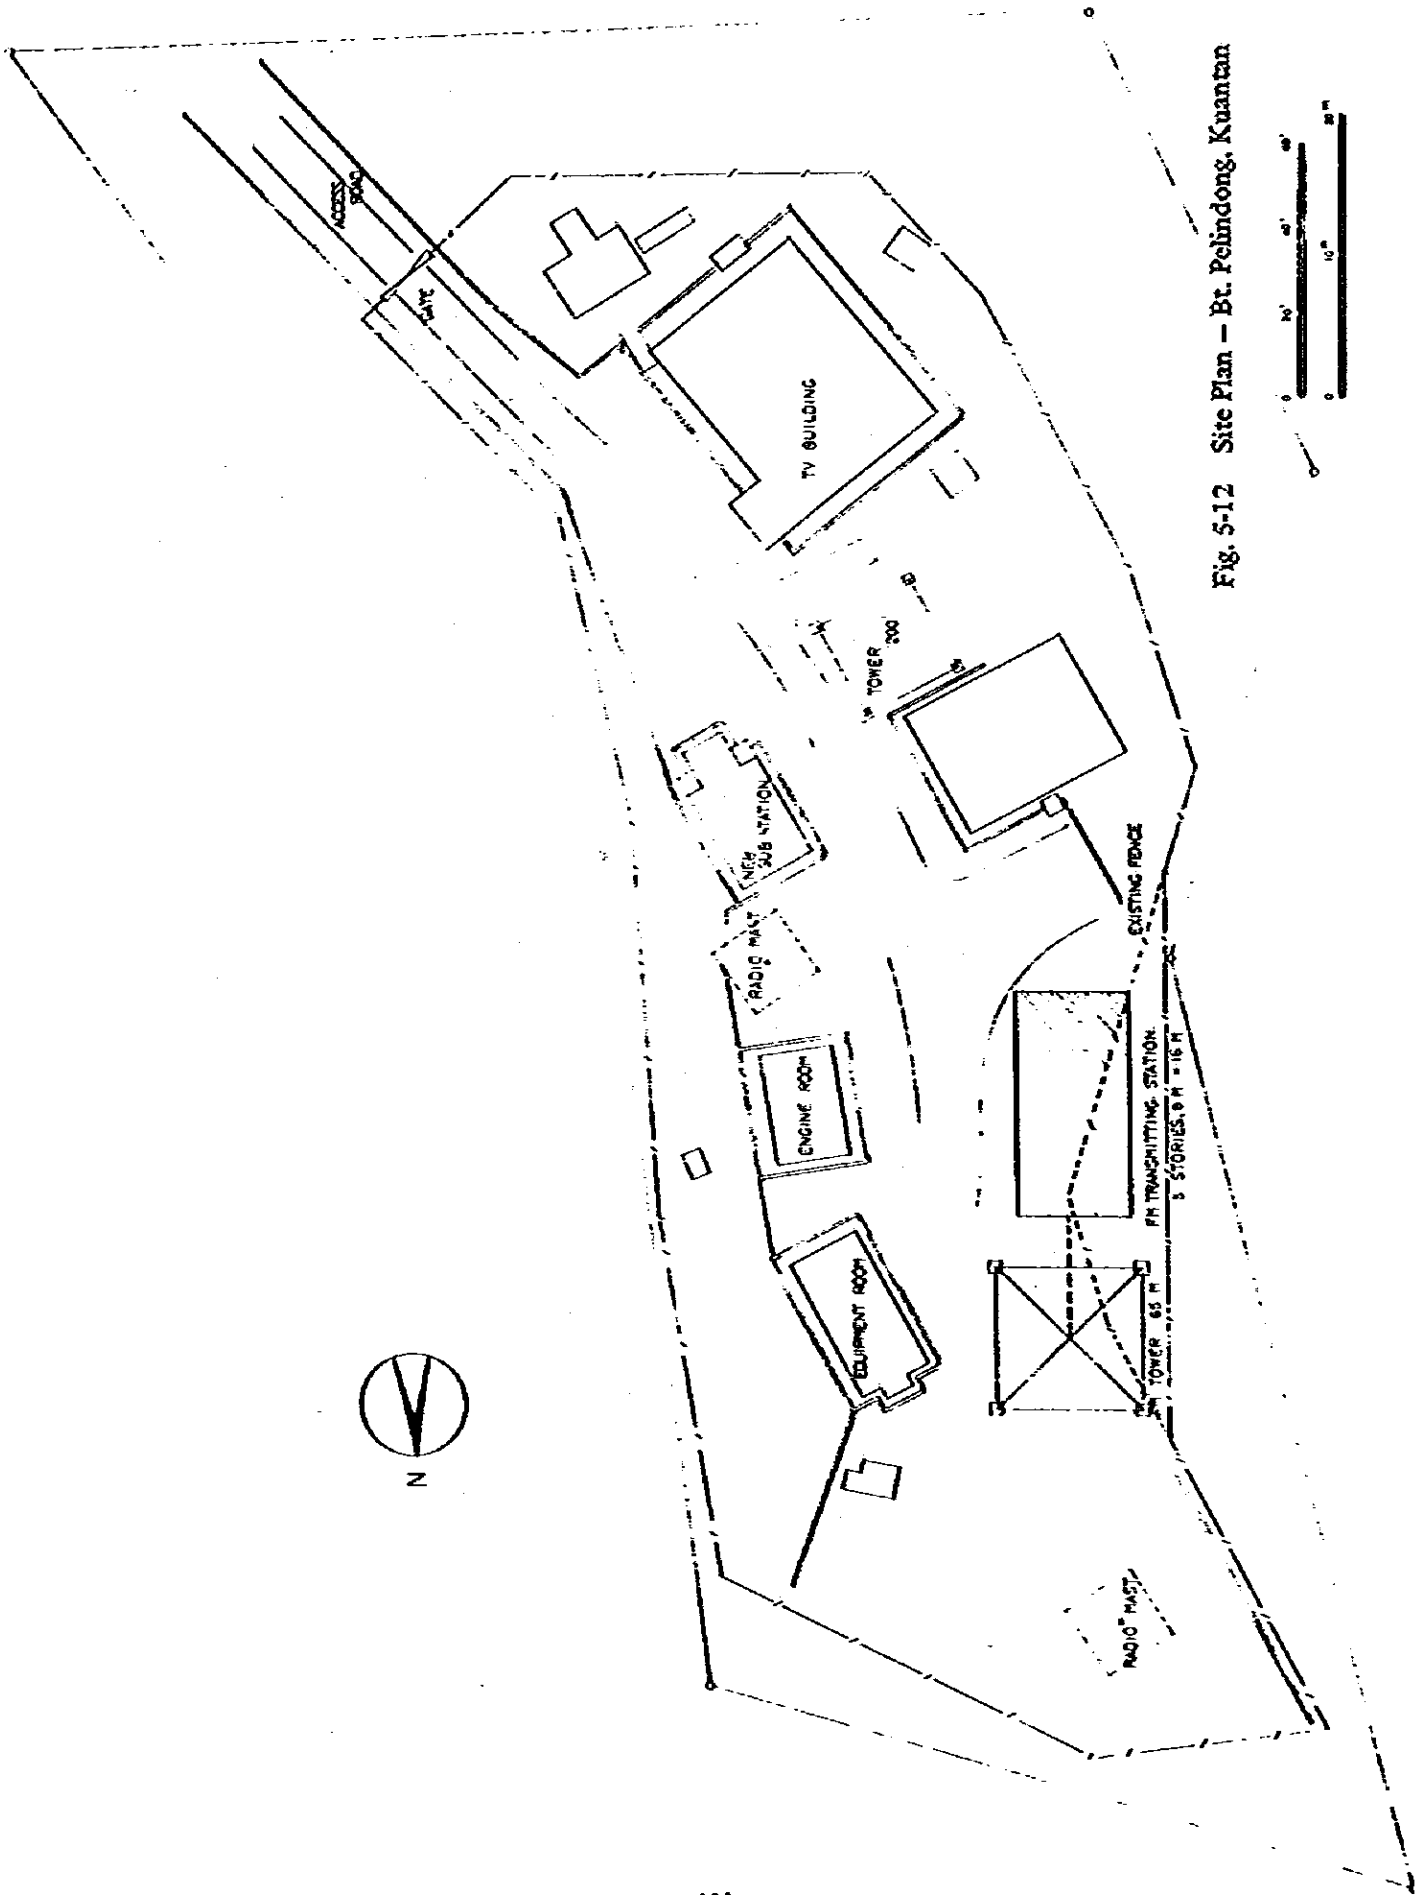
Site Plan - Bt. Peibdong, Kuantan
